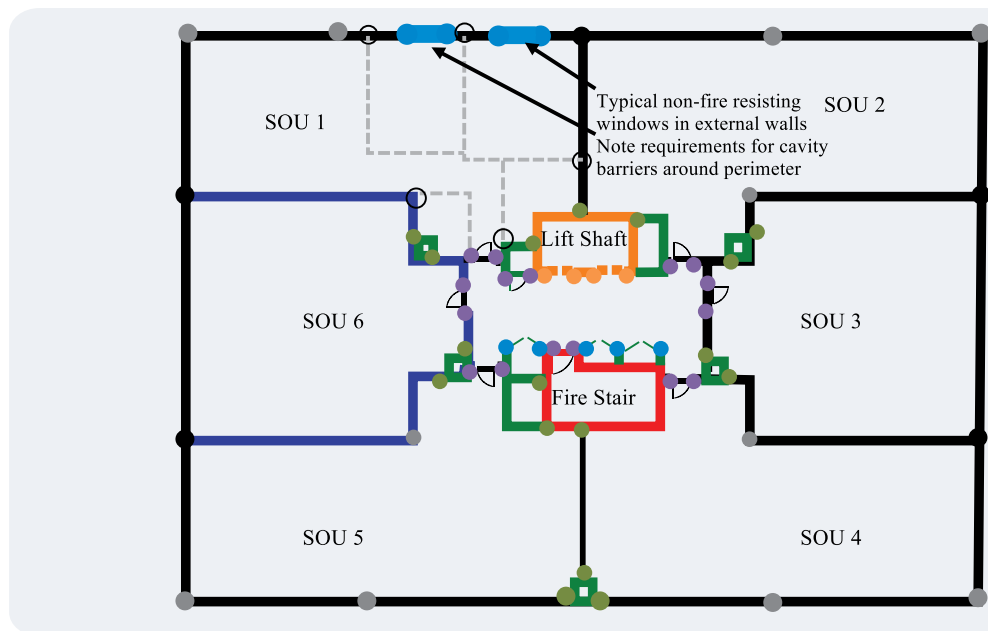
Floor plan section of an apartment building showing typical cavity barrier positions.
